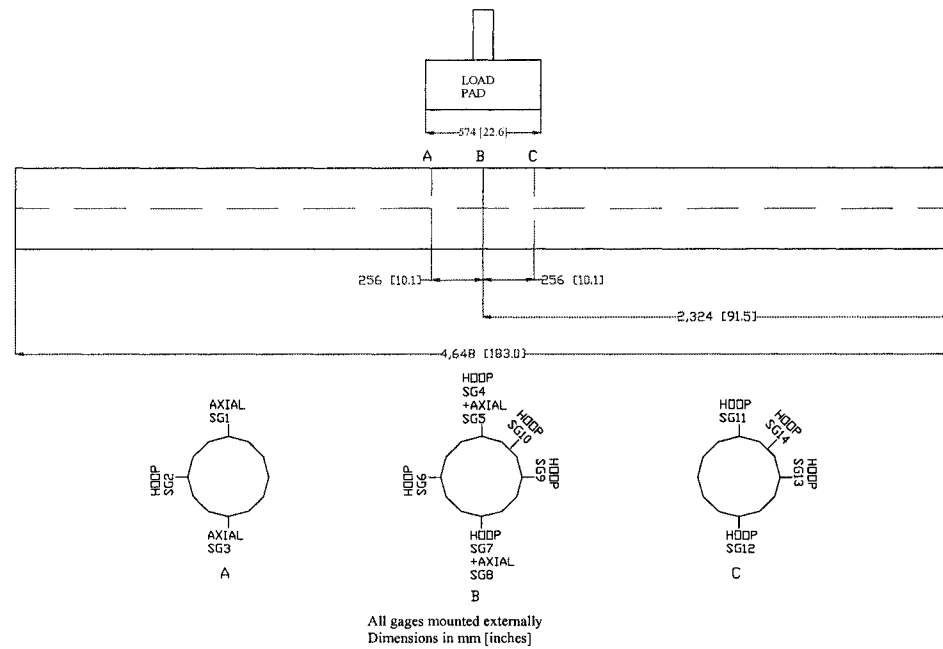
Strain Gage Layout for Full-Scale Testing
